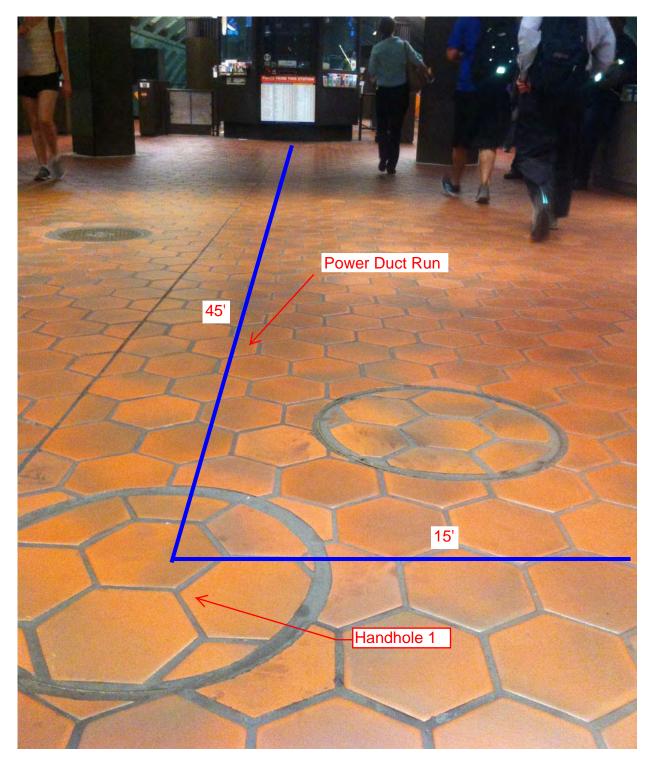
Power duct run from Handhole 1 to Handhole 2 on mezzanine floor.
